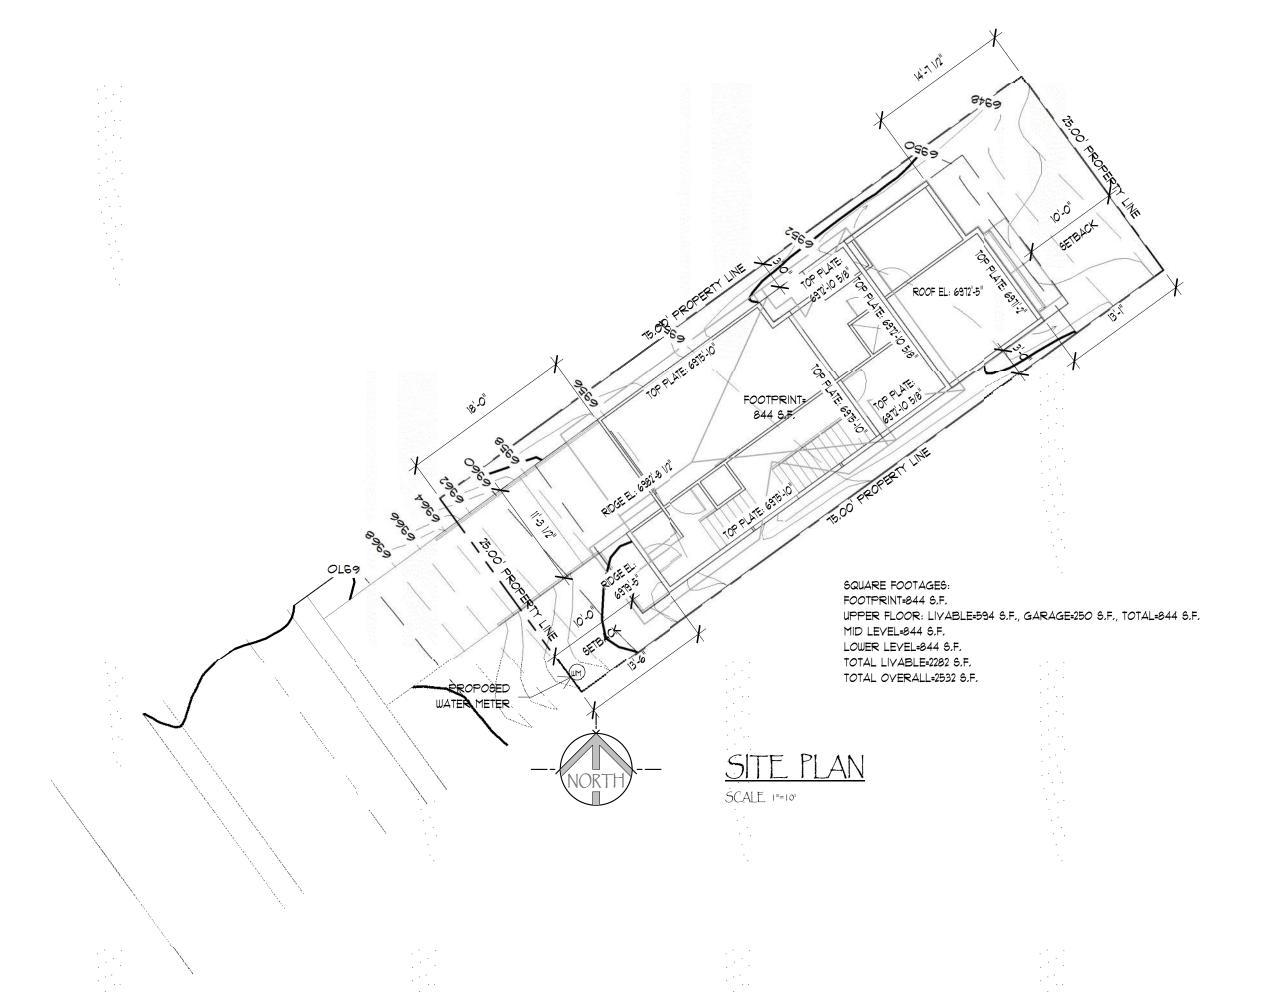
Exhibit A- Plans (existing conditions, site plan, elevations, floor plans)
